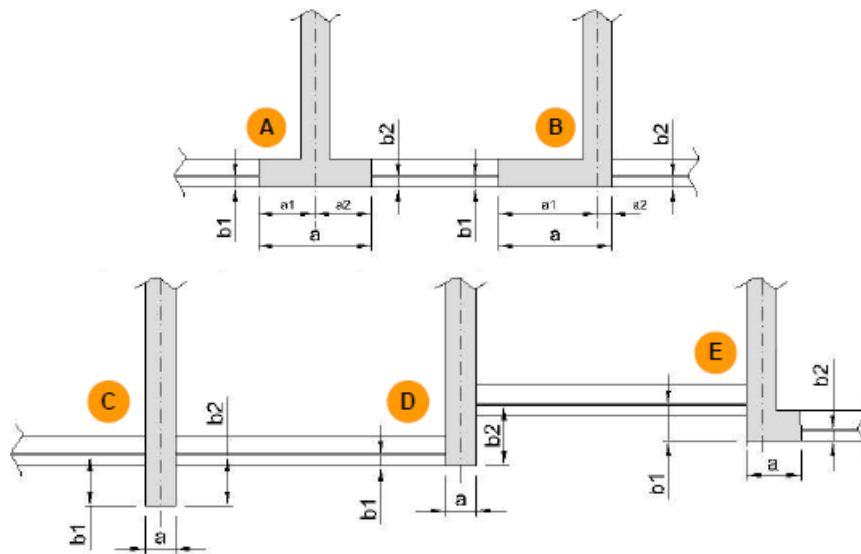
E 60 fire-resistant facade element at the vertical compartment walls level
